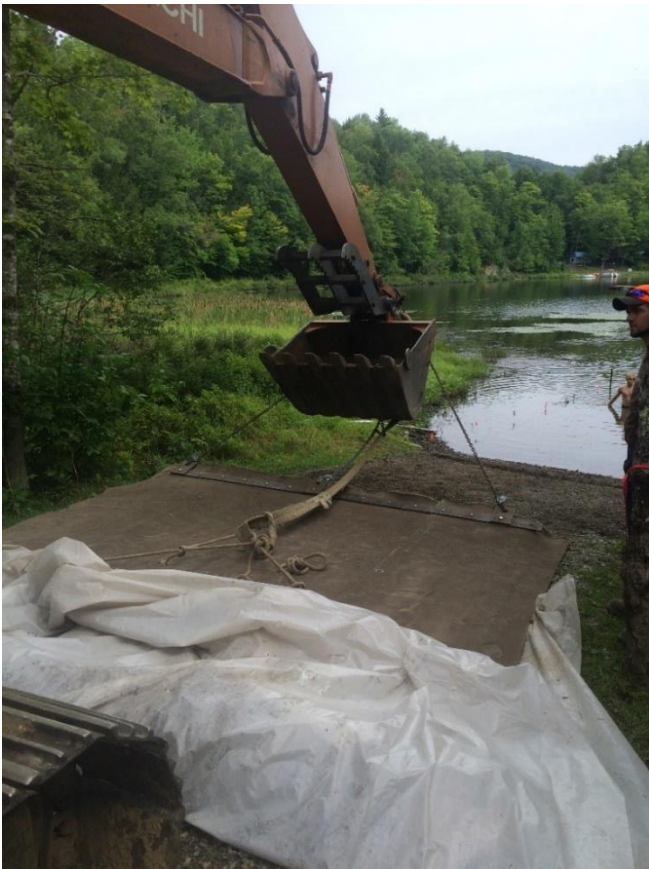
Concrete cloth being dragged into place on the gravel bottom of the Dog Pond Access Area, Woodbury, VT, August 2016.
